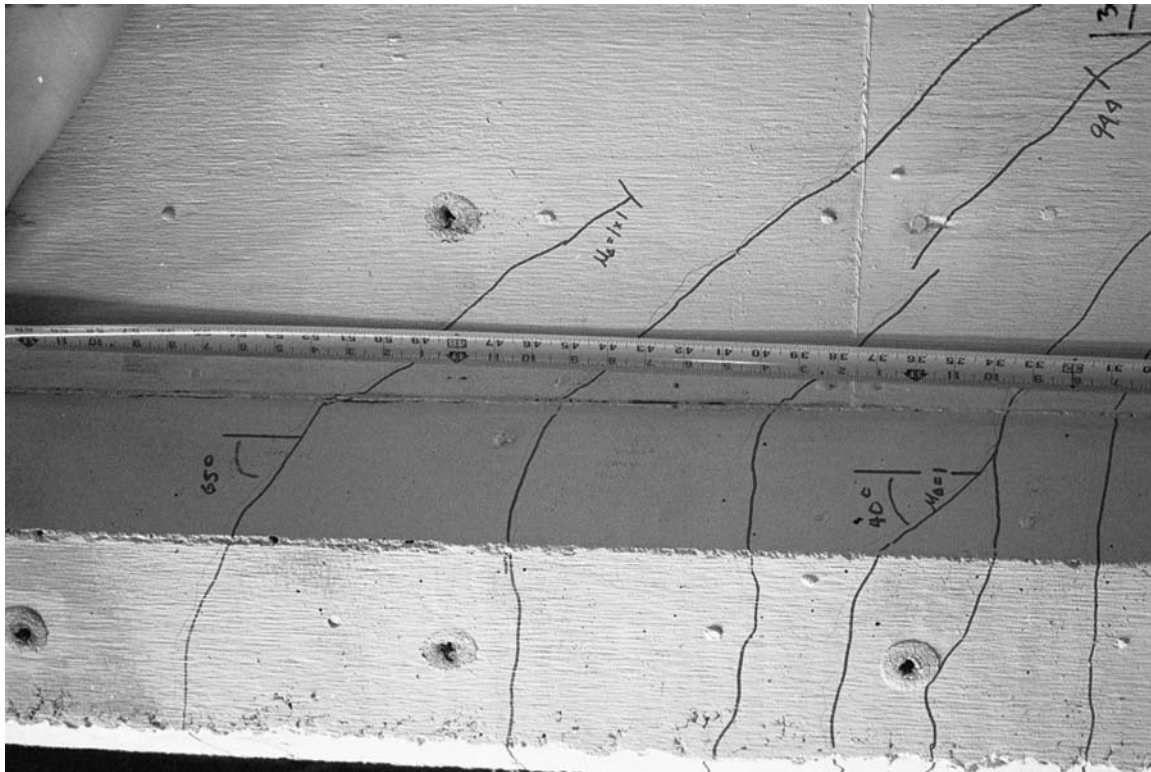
Unit 2A;  $\mu_{\Delta} = -1.0 \times 1$ ;  $F = -105.4 \text{ kips}$   $[-469 \text{ kN}]$ ;  $\Delta = -0.35 \text{ in.}$   $[-9 \text{ mm}]$ : Flexural cracks steepen into shear cracks in the tension boundary element chamfer. The crack at 36 in.  $[914 \text{ mm}]$  height is angled at  $40^\circ$  from the vertical.
